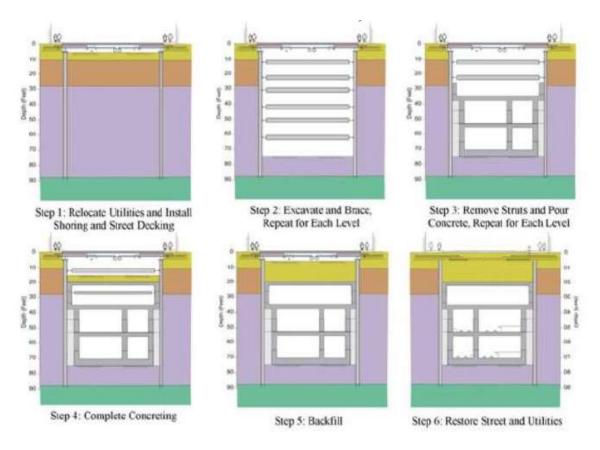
Procedure of cut and cover tunnel construction (Mohammed, 2015)
